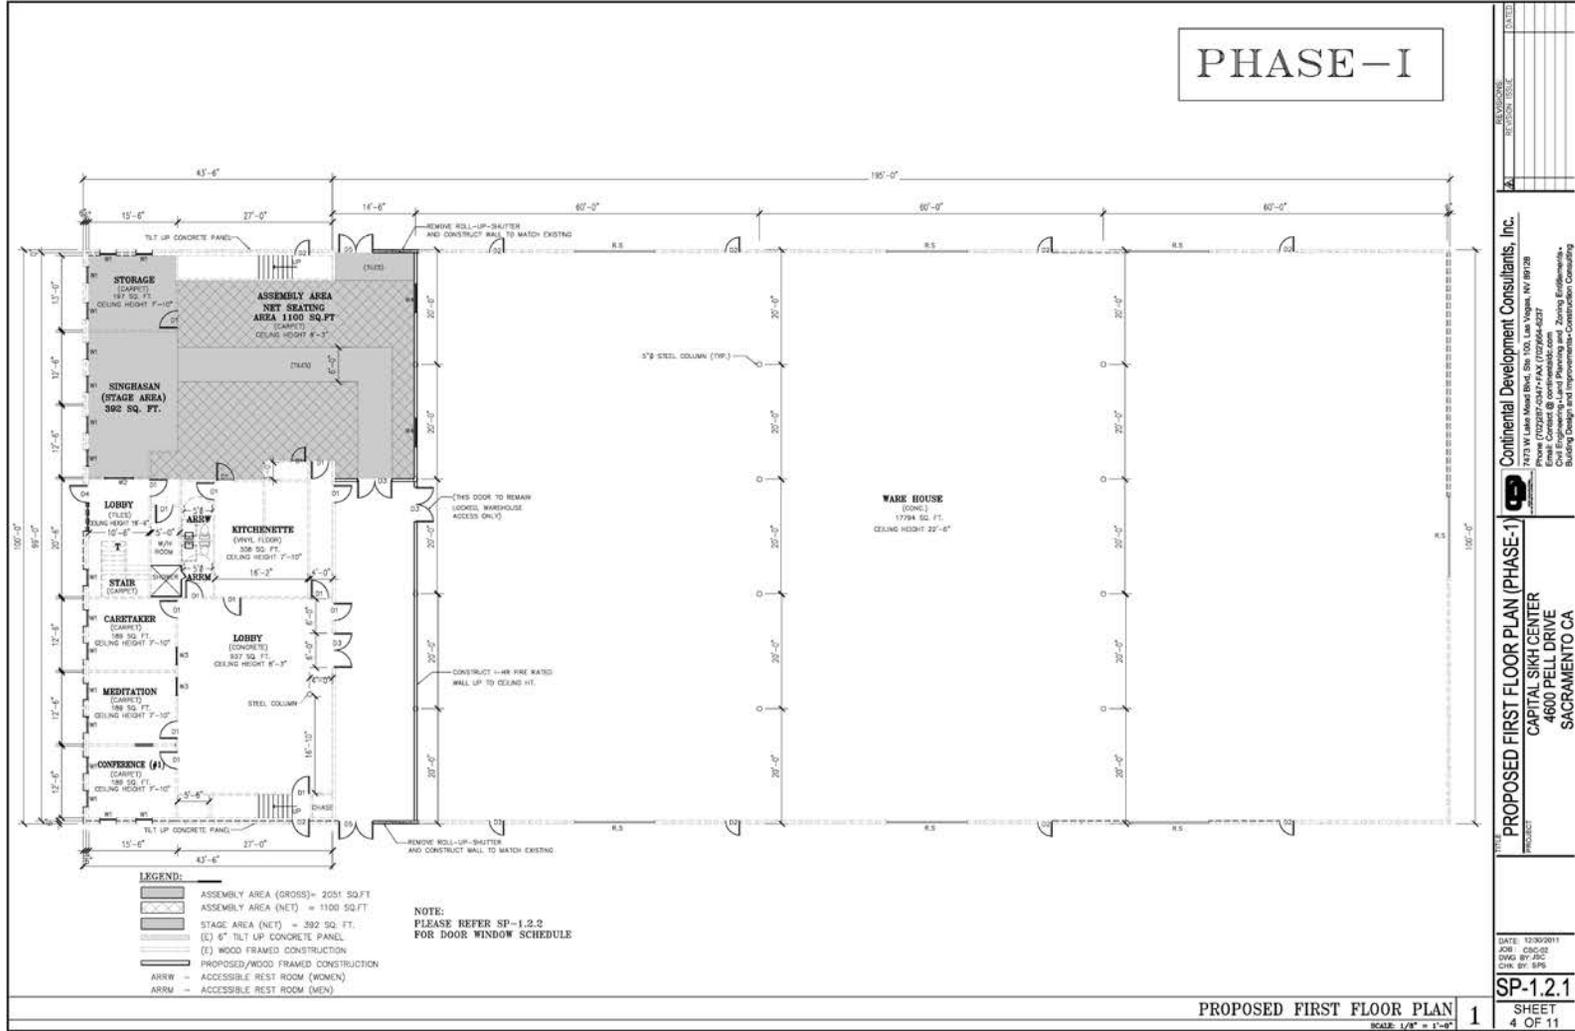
D: Proposed First Floor Plan (Phase 1)
